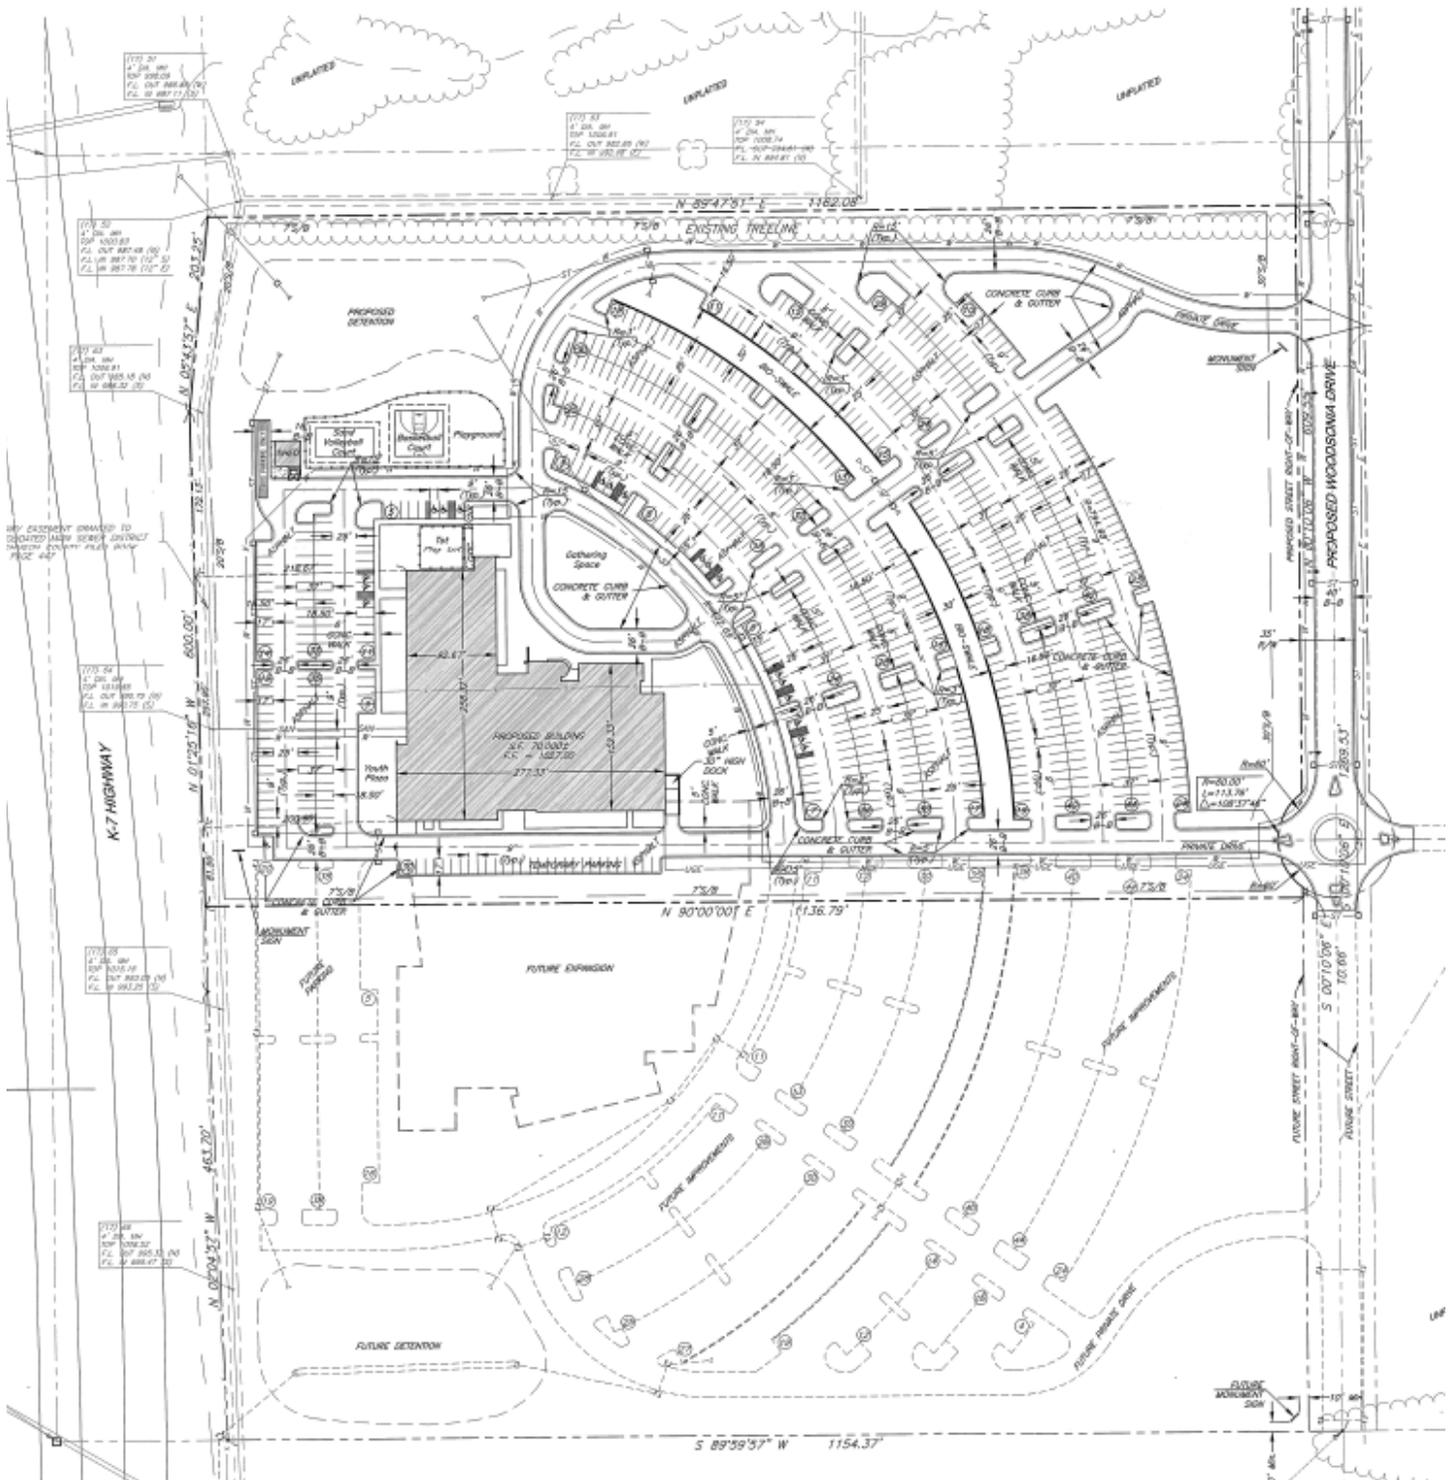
Preliminary Plan (PL04-11) Showing Future Expansion
